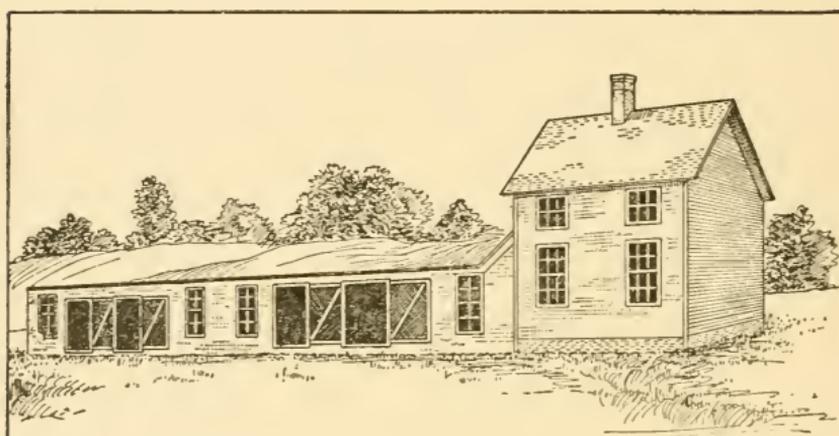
FIG. II—MESSRS. PERRY'S WELL-ARRANGED HOUSE
